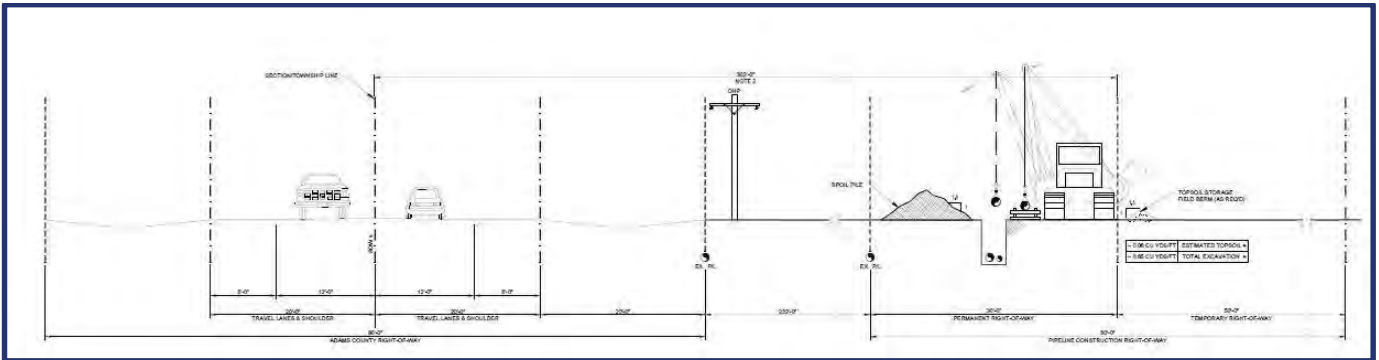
Powhatan Rd. (Area 3) ROW Ditch Profile, Collector (Rural)
